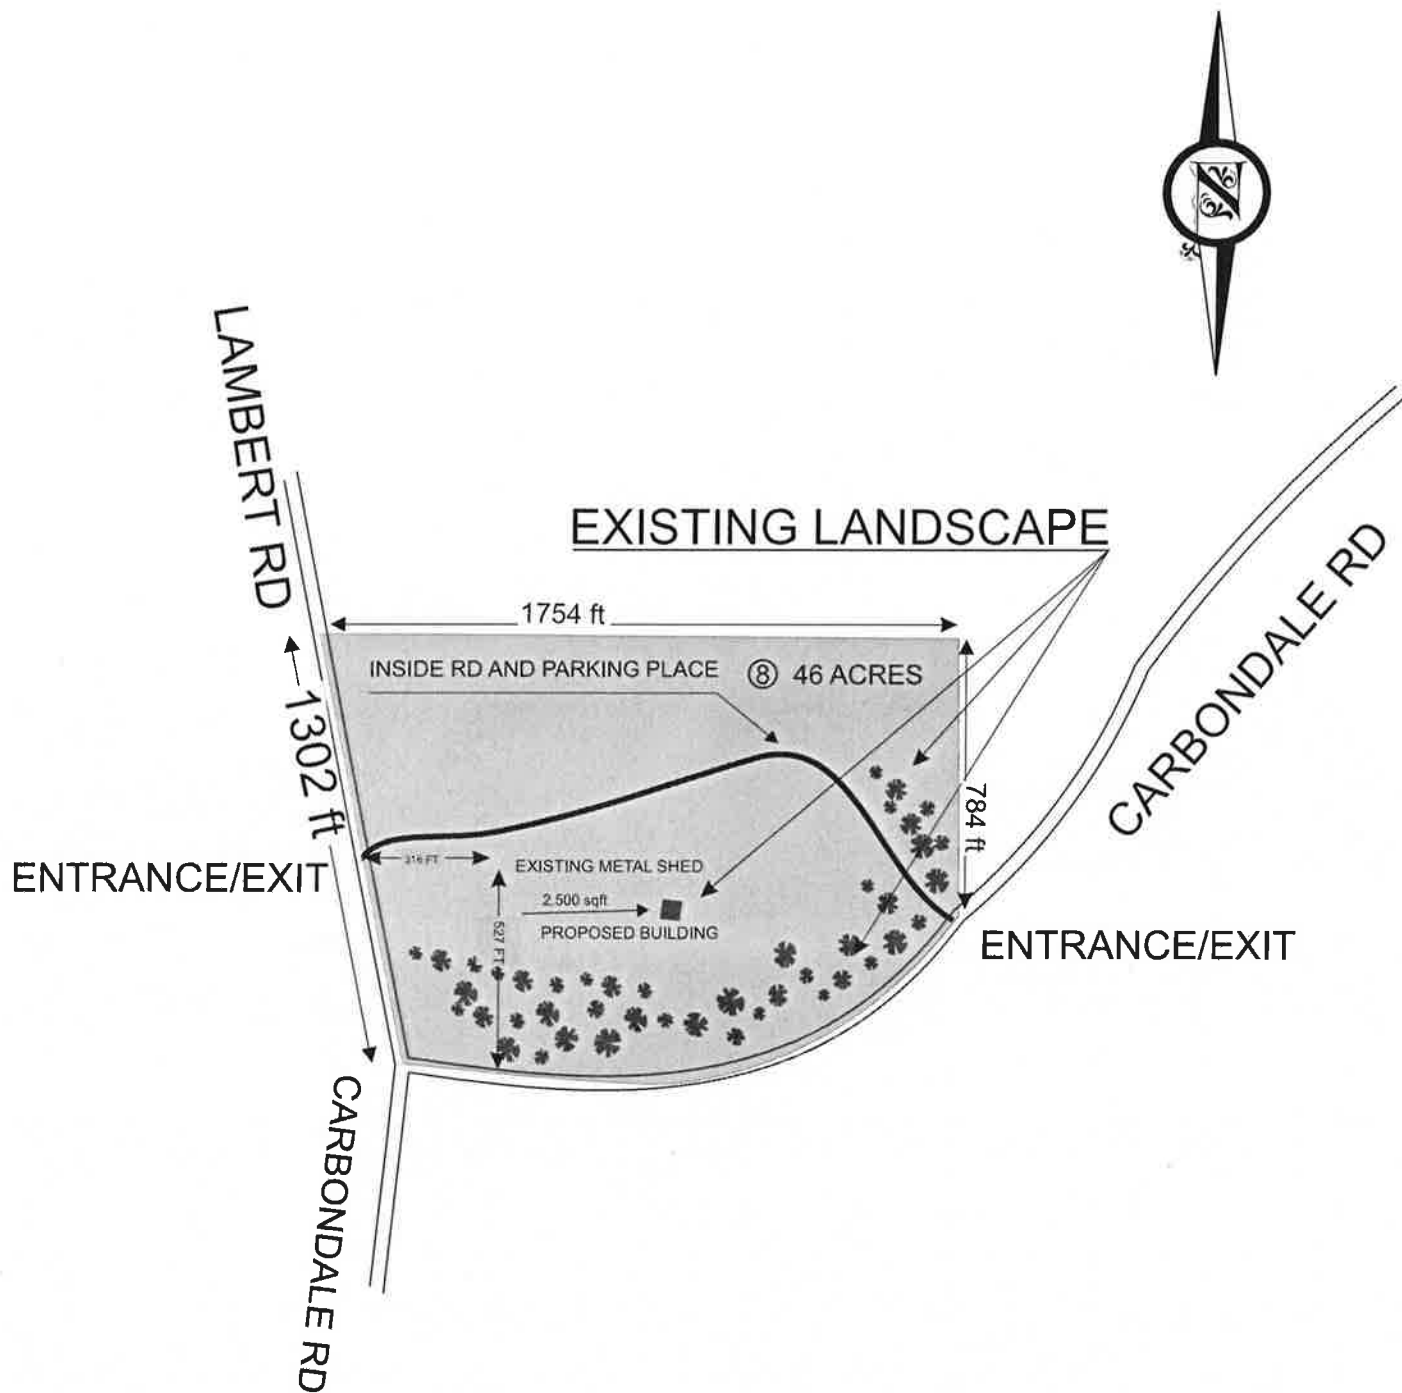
View of Proposed Cemetery Site With proposed Improvements
